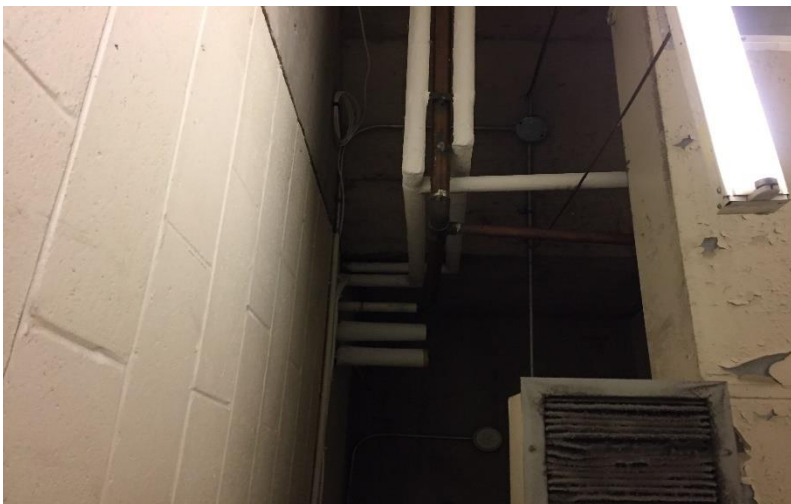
View of lead containing beige paint observed to be in poor condition in Room 023A.
